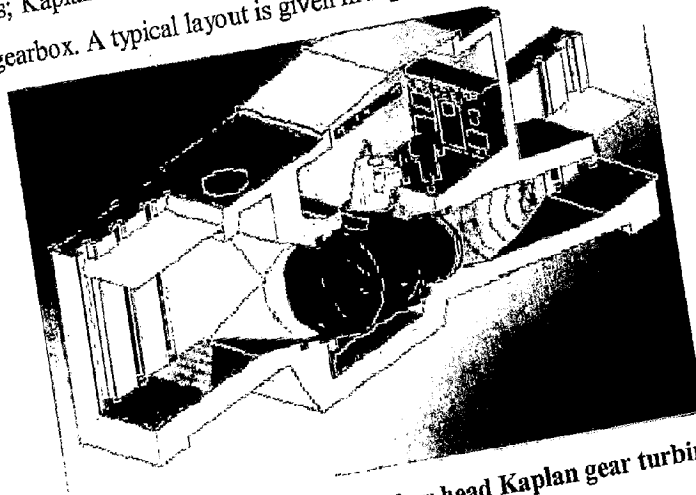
Illustration of inclined axis, low head Kaplan gear turbine unit [10]
